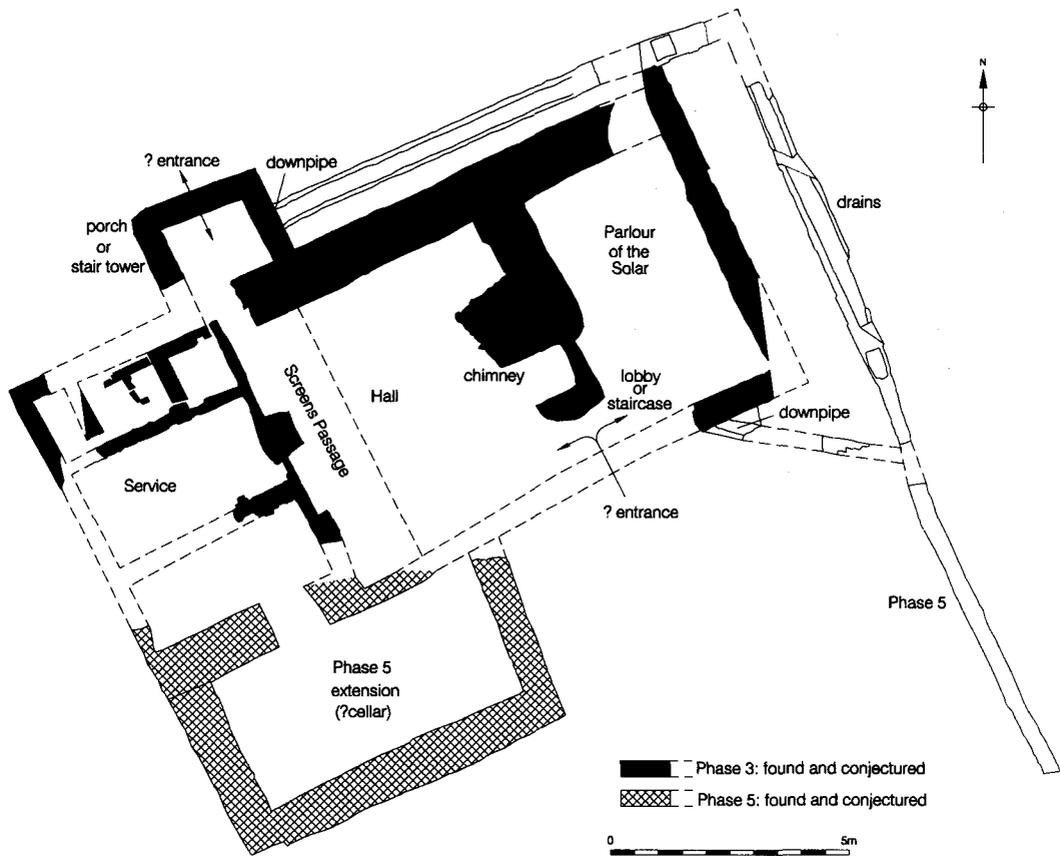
Phases 3 and 5: Building [B3] — floor plan interpretations
